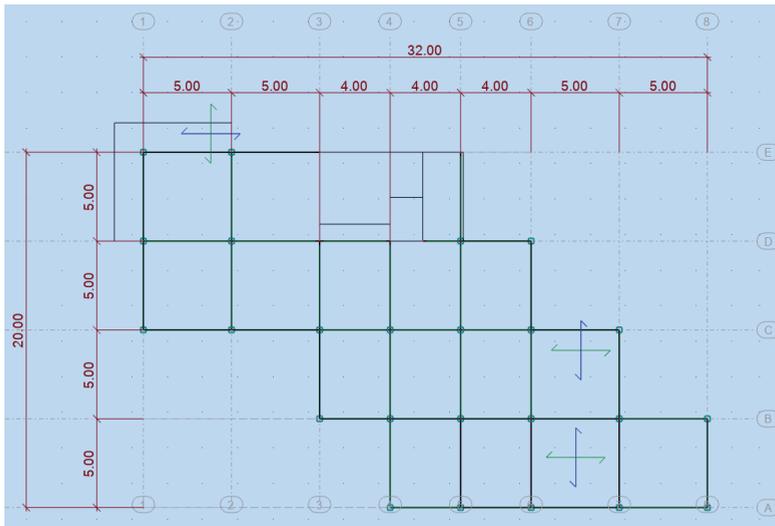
Projection of reinforced concrete structure for level 4 (12.03 m) read from ROBOT
